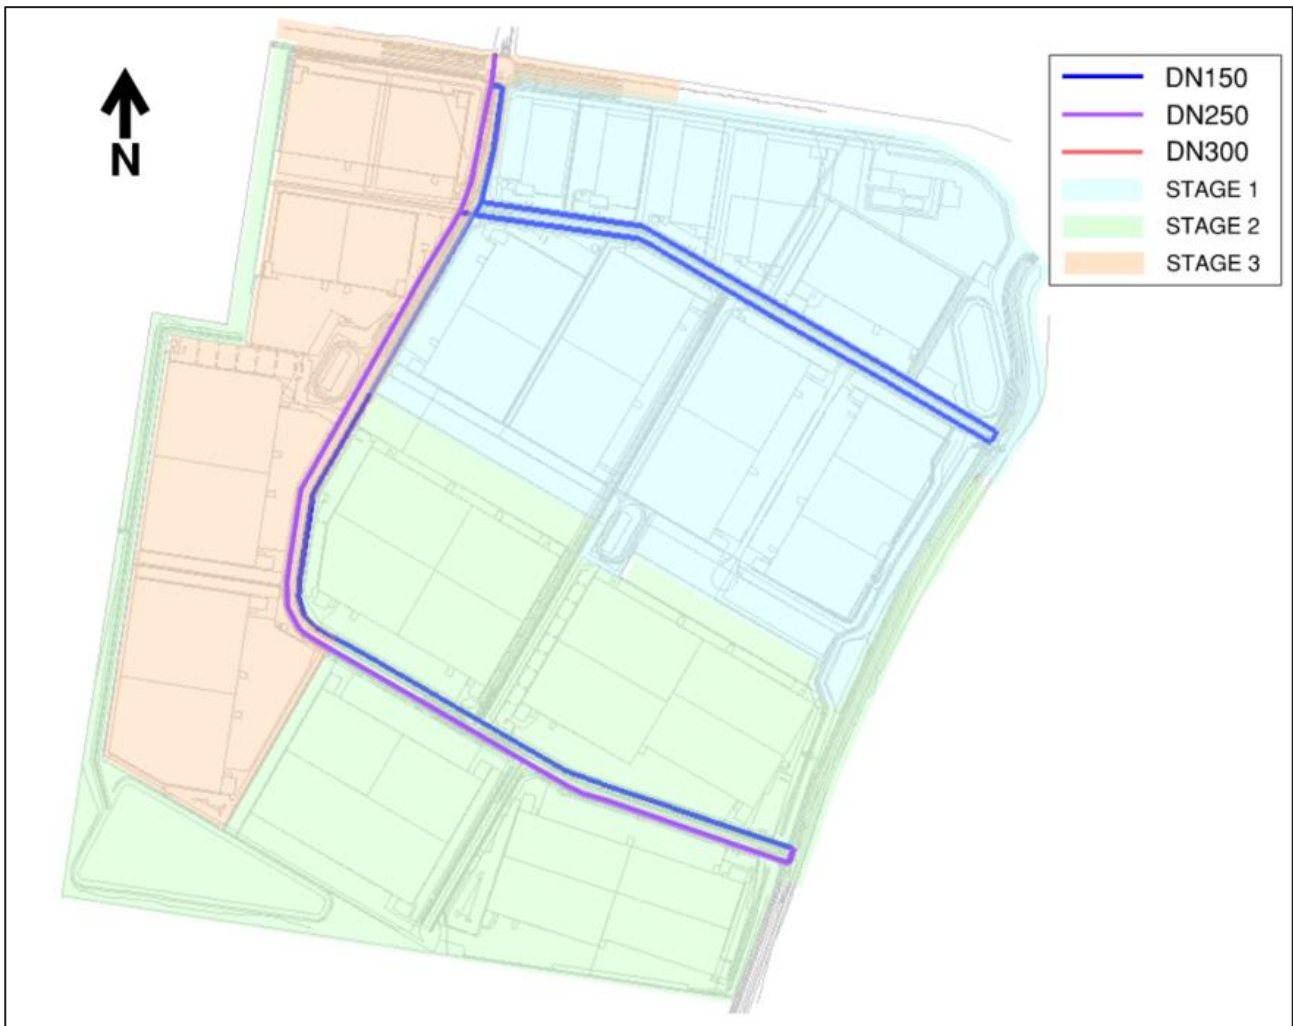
Concept Stage 1-3 Internal Water Network Layout
